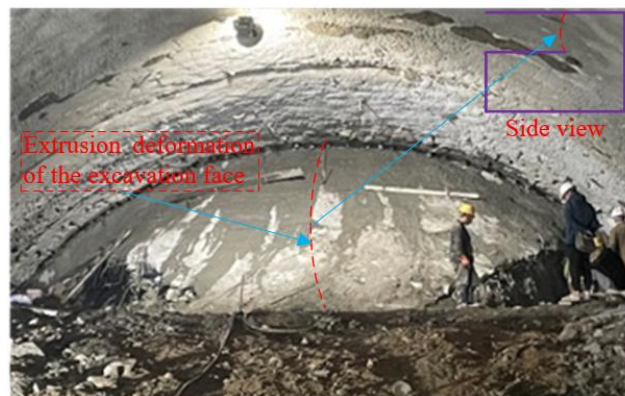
The on-site extrusion deformation phenomenon of the excavation face of tunnel
